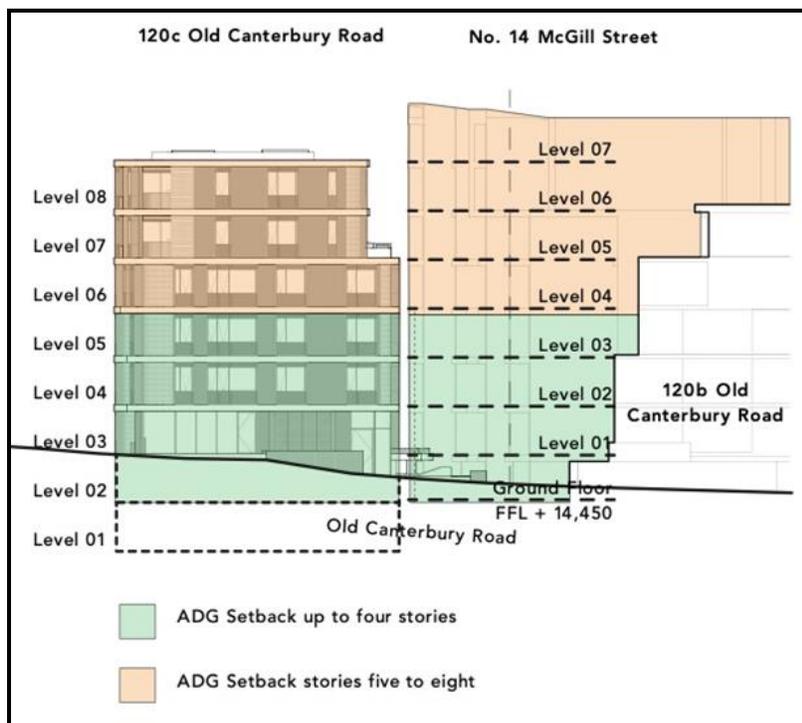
Blanket Diagrams illustrating floor levels and ADG building separation requirements
